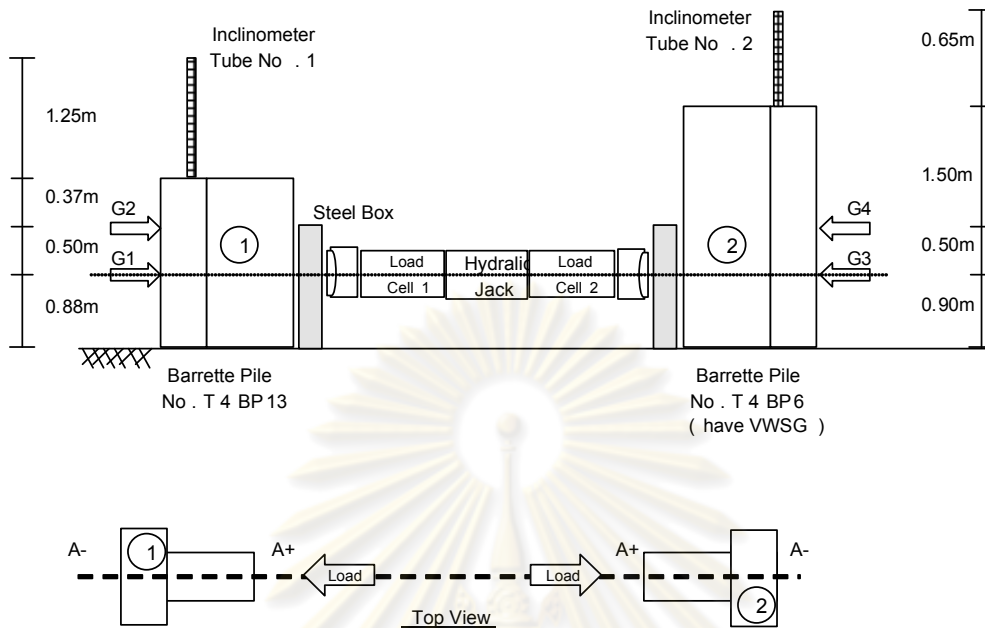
Layout for Static lateral load test on T-shape barrette with loading frame
